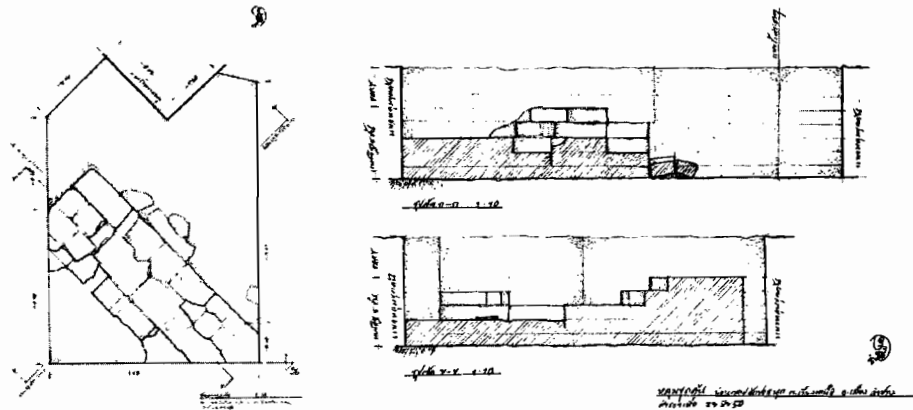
Plan and Sections of the foundation and the basement of *viharn
